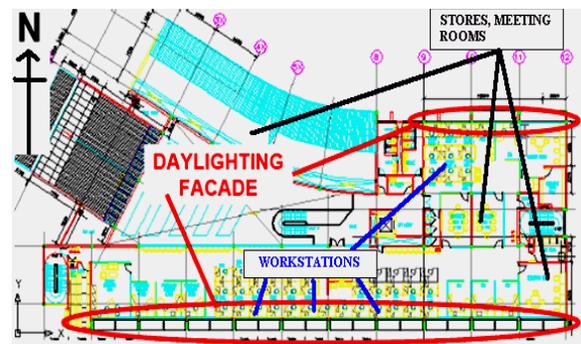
The interior space layout of GEO building shows the workstations are designed along the facades. The building is also L-shape on plan and the daylighting facades are also facing north and south
